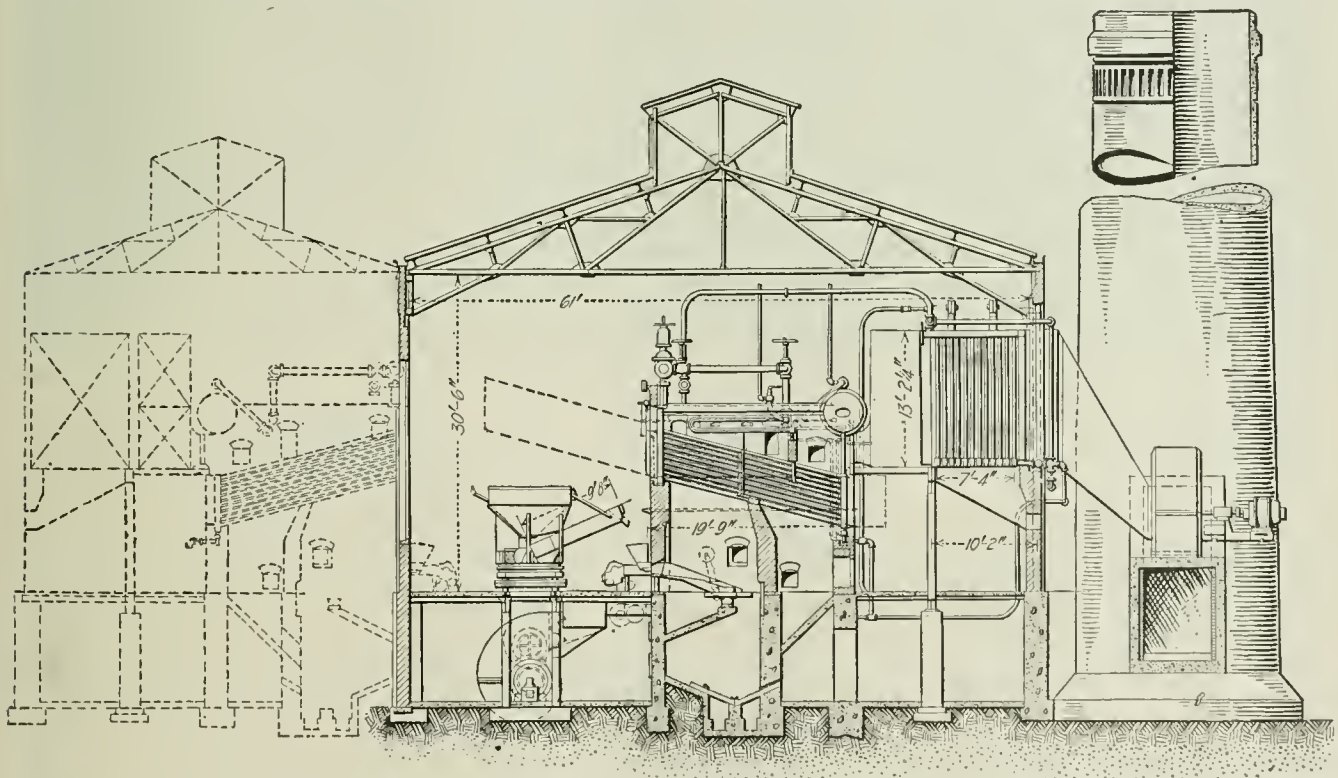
CROSS-SECTION OF BOILER HOUSE, SHOWING PRESENT AND FUTURE BOILER ROOM AND ARRANGEMENT OF FORCED DRAFT, STOKERS, FLUES, ECONOMIZERS, ETC.
